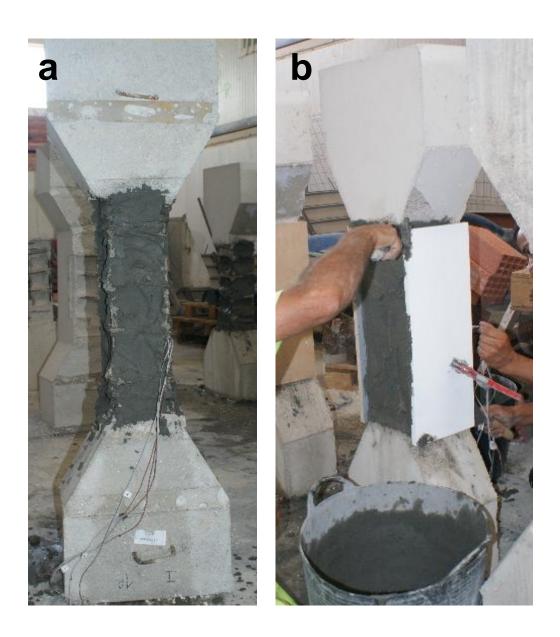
a) Filling the first face of the column; b) Two-sided formwork and filling the rest of the front and back faces of the specimen.
